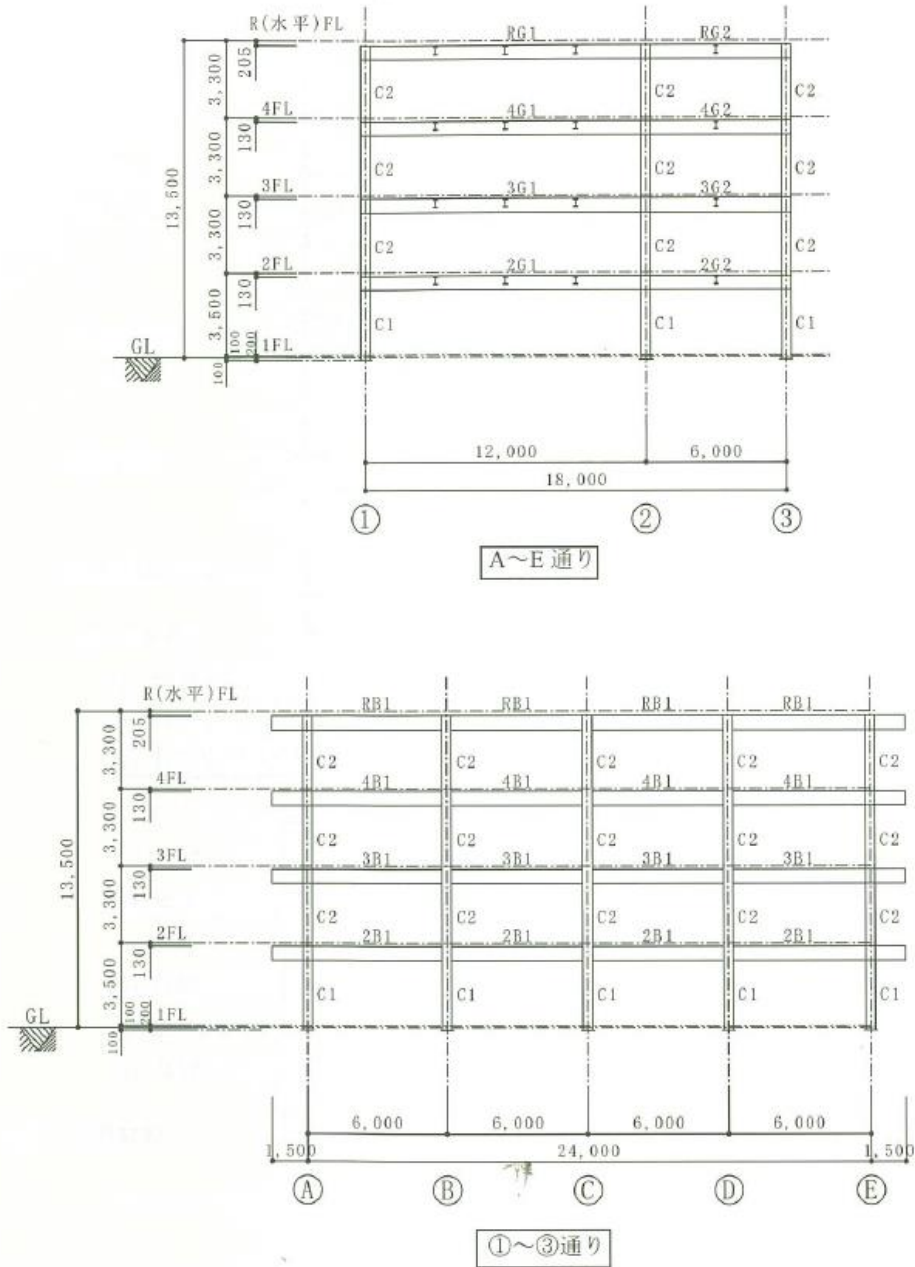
Typical Elevation Plan for Office Buildings (Japan Building Disaster Prevention Association 2011)
